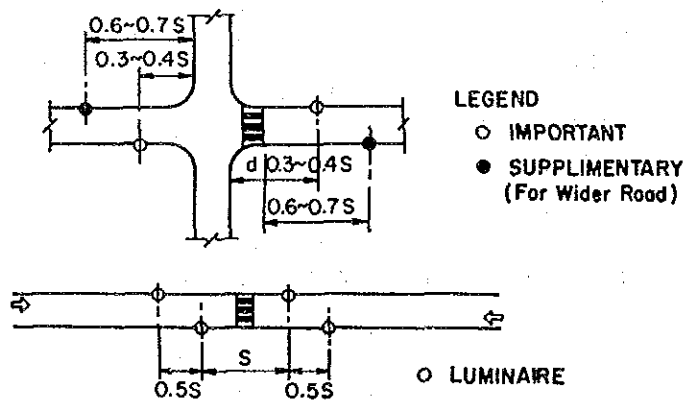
Typical Luminaire Arrangement (Crosswalk)
